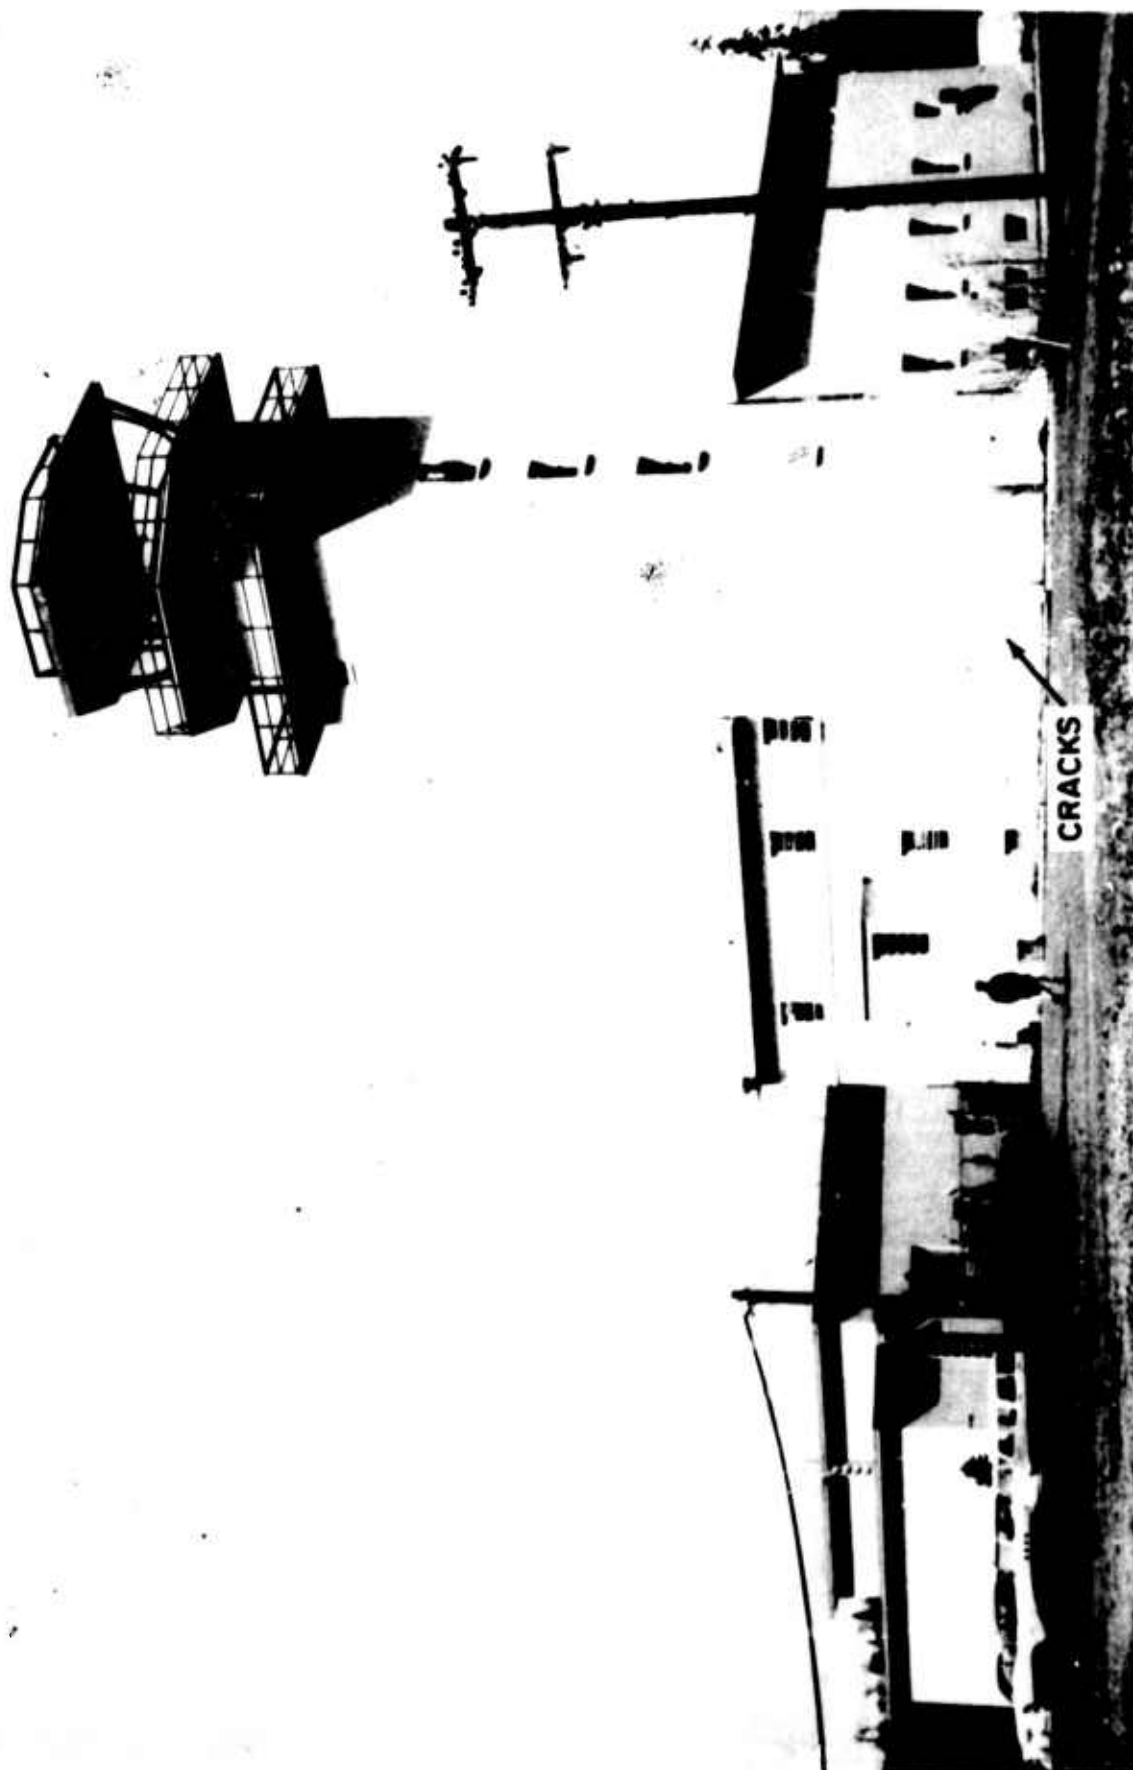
Elmendorf AFB Aircraft Control Tower (Southeast corner of tower)
